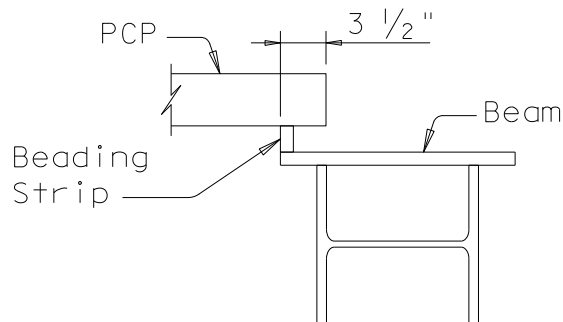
Cross-Section of Traditional Connection PCP Specimen
